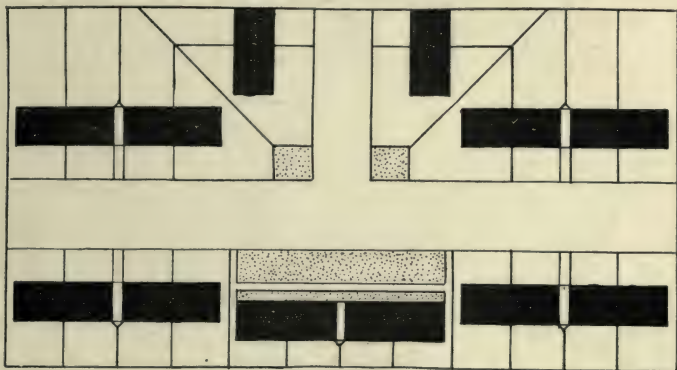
In this diagram the arrangement of houses on the lower side of the road suggests that the side road was planned to enter it at this particular place. Compare with Fig. 109.
